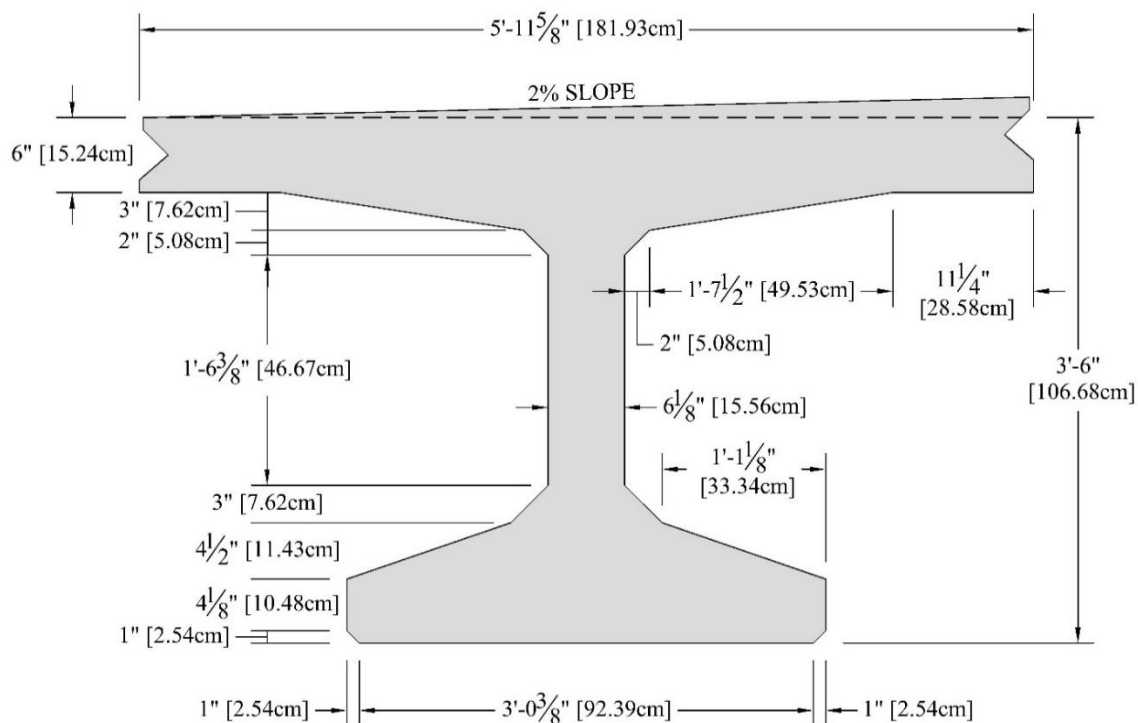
Dimensions of a typical bridge bulb-tee girder at centerspan.
